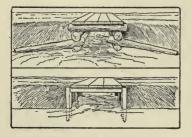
Pioneer wooden culverts are being rapidly supplanted by stone and cement.
